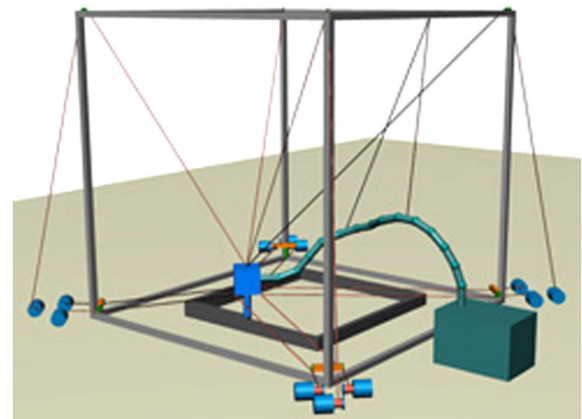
C^4 robot building a structure (concrete hose and storage tank shown).
